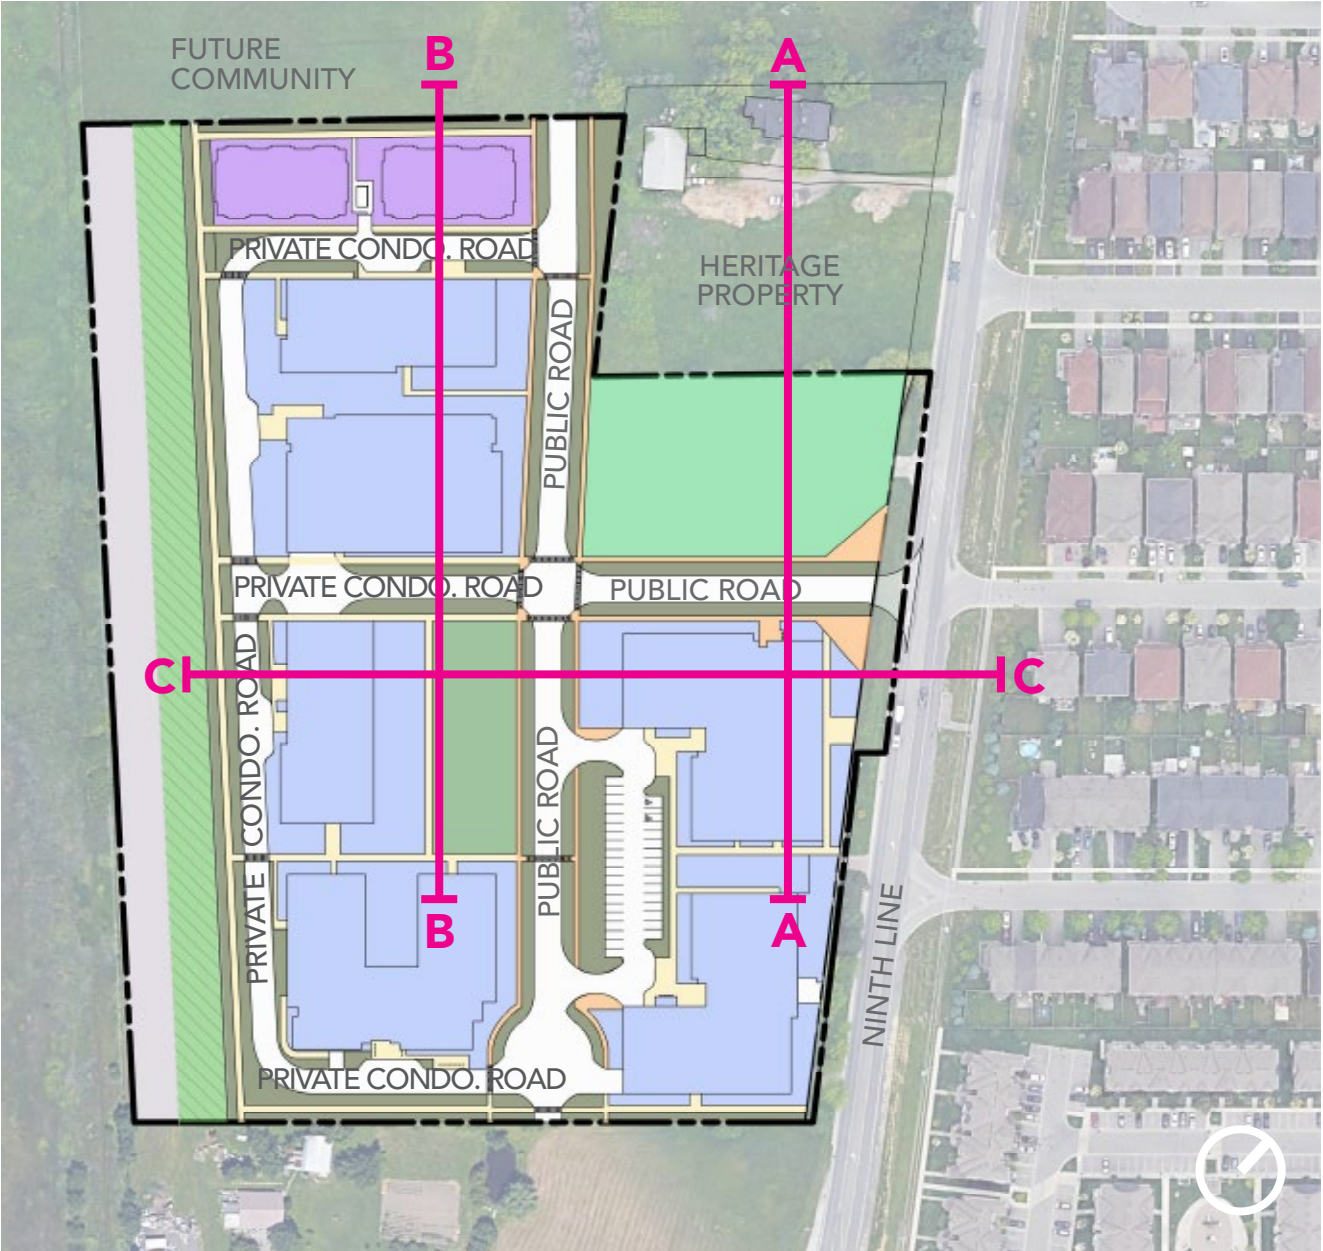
Key plan indicating the location of sections (refer to Figures 19 to 21)
